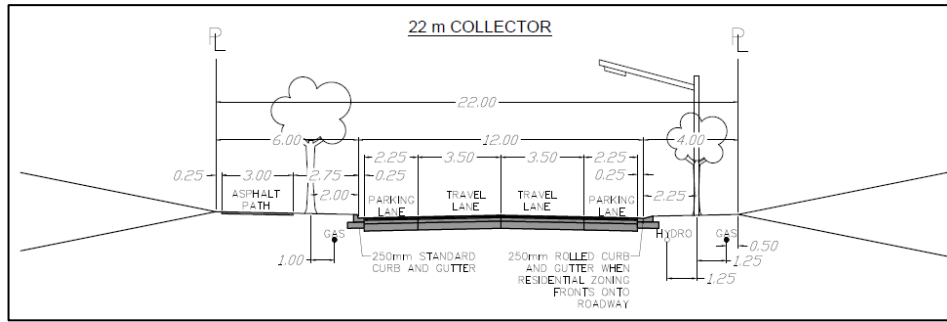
22m Collector Sample Cross Section (source: Arcadis IBI Group FSR)
